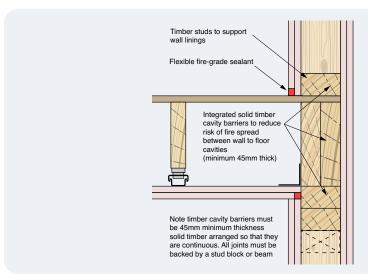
Fire-protected single stud timber frame wall /floor junction with integral cavity barriers – beams parallel to wall Class 2 building.
